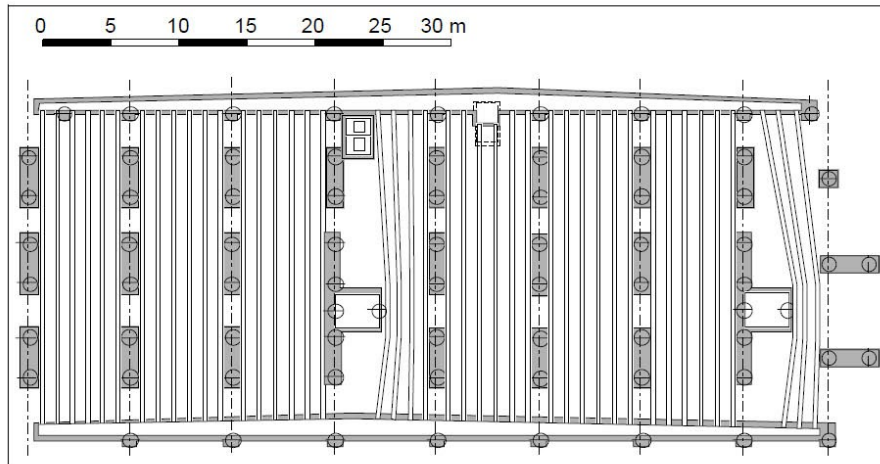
General layout and construction detail of the EAHE system in Schwerzenbacherhof building (Hollmuller, 2002).
